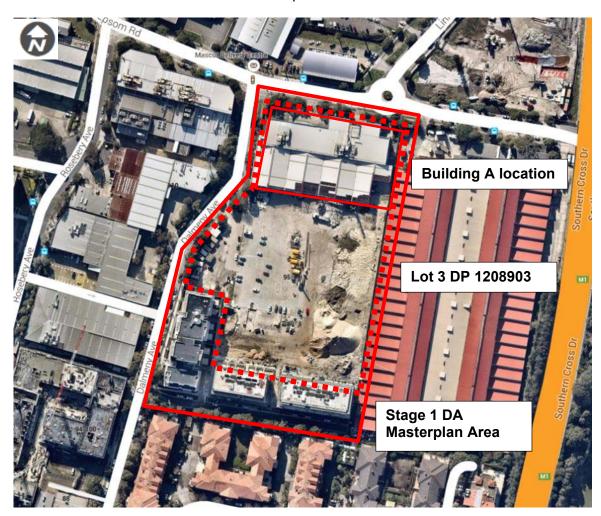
Aerial image of subject site, showing Stage Masterplan area, current Lot (Lot 3 DP 1208903) and Building A location
